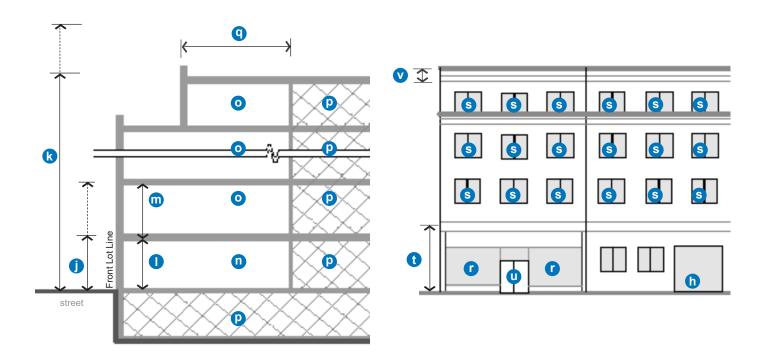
(G)(2). Limited Bay Building: Height & Use Requirements.
